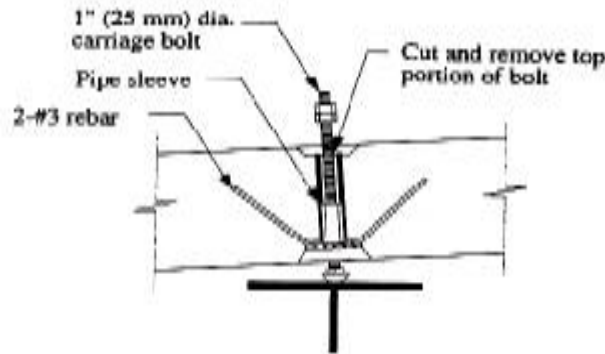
Leveling bolt detail of Bridge 03200
